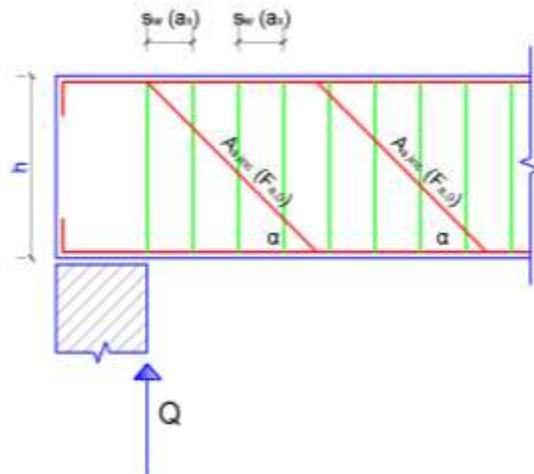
Stirrups and inclined reinforcing in a beam
